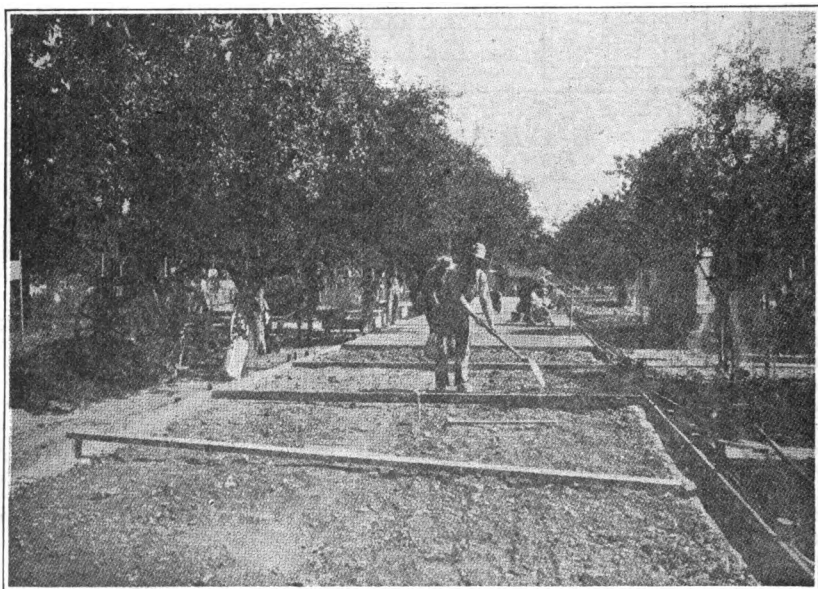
Tamping in cinders and rocks before the concrete is laid. The rocks and cinders are used for filler and drainage. Foundation and floor such as are used in the fool-proof laying house for 500 hens.
